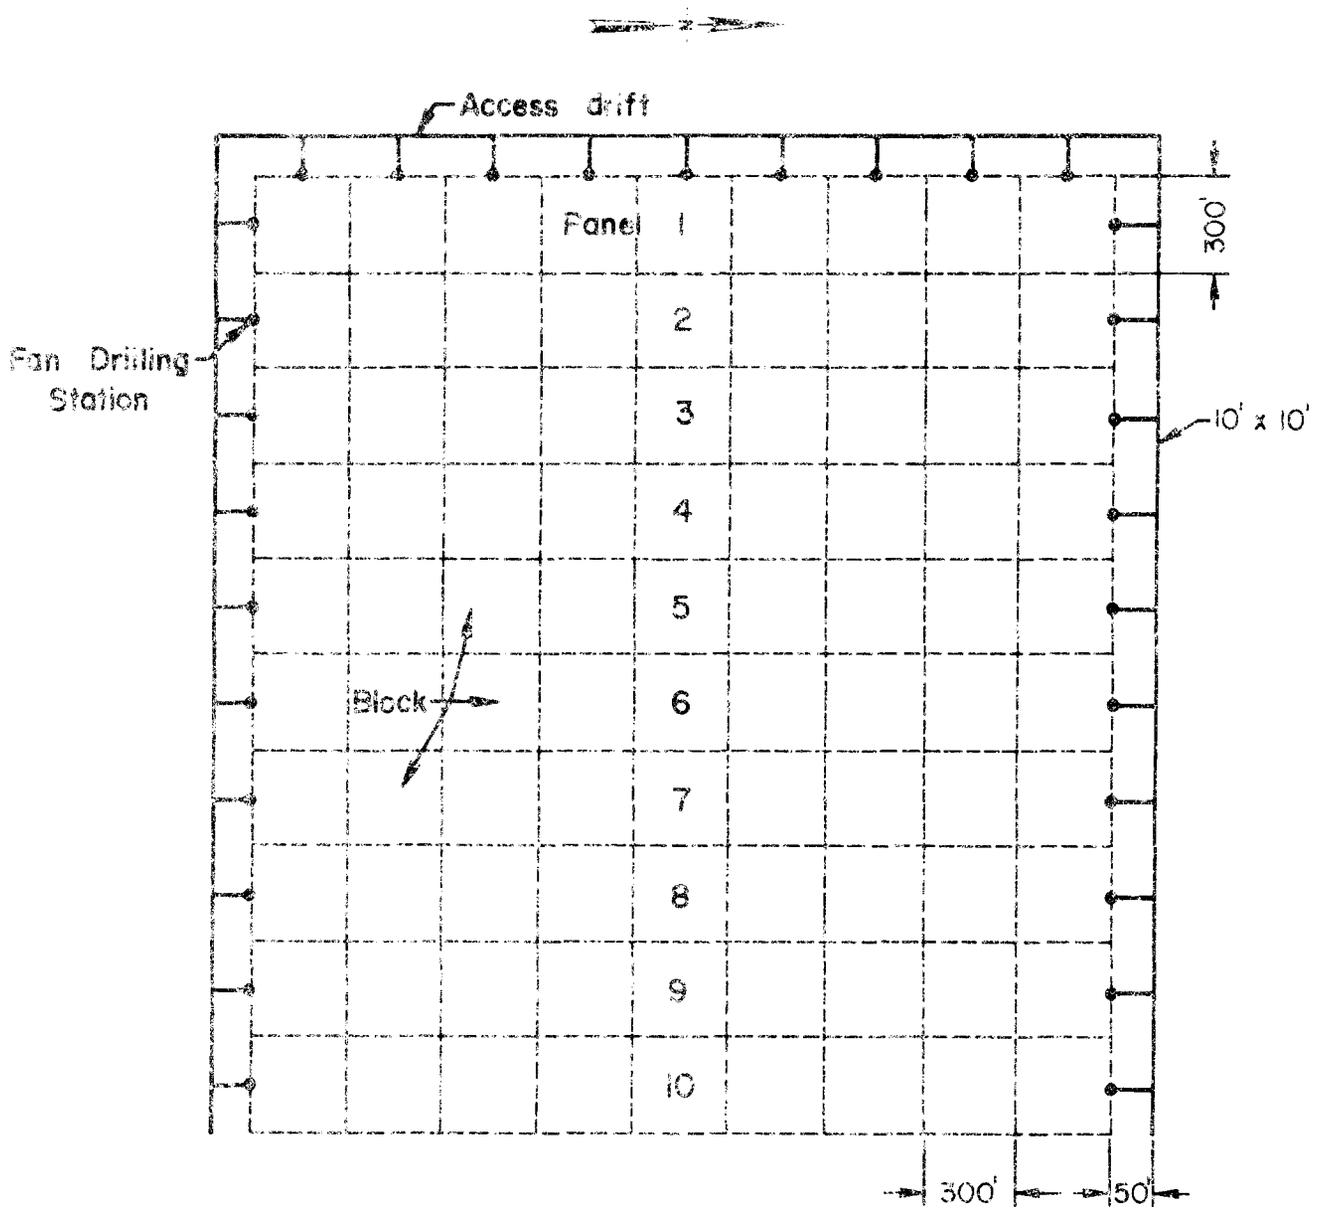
Plan View of Access Drift and Fan Drilling Stations for Induced Caving
